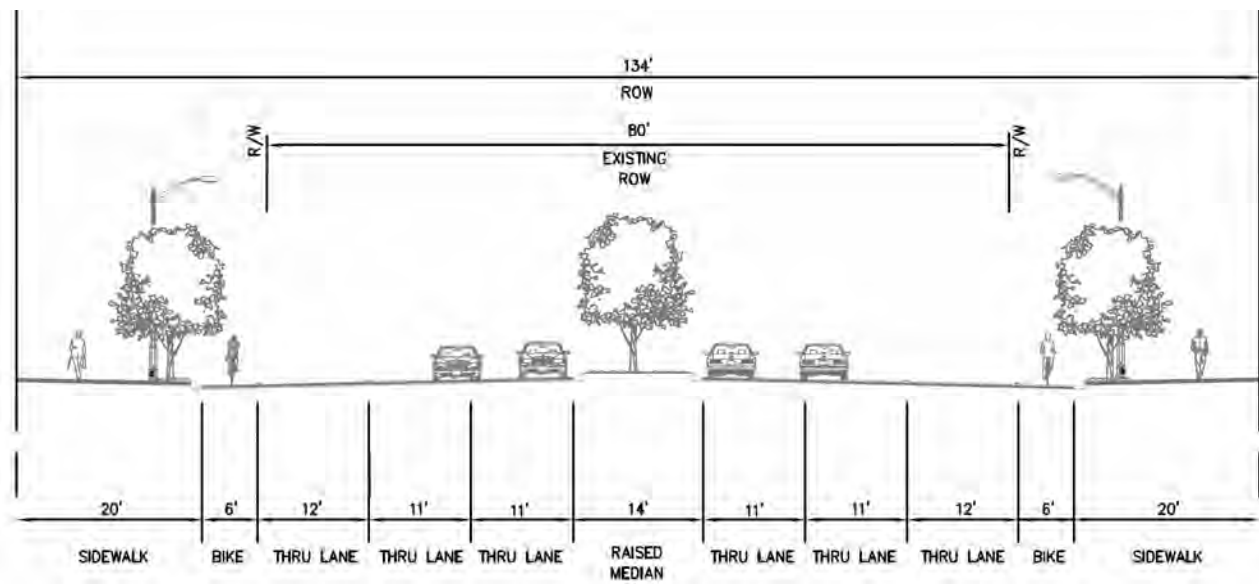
Proposed Cross Section, H Street Between Broadway and I-5
